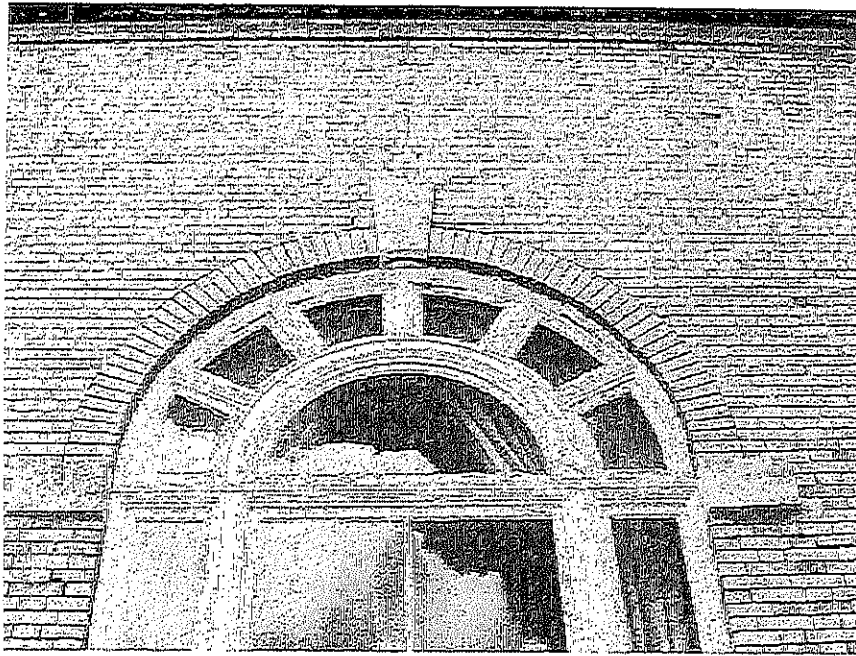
Deteriorated paint, loose wood trim, open mortar joints, and missing sealant in the joint between window frame and brick openings permit water and air infiltration.
